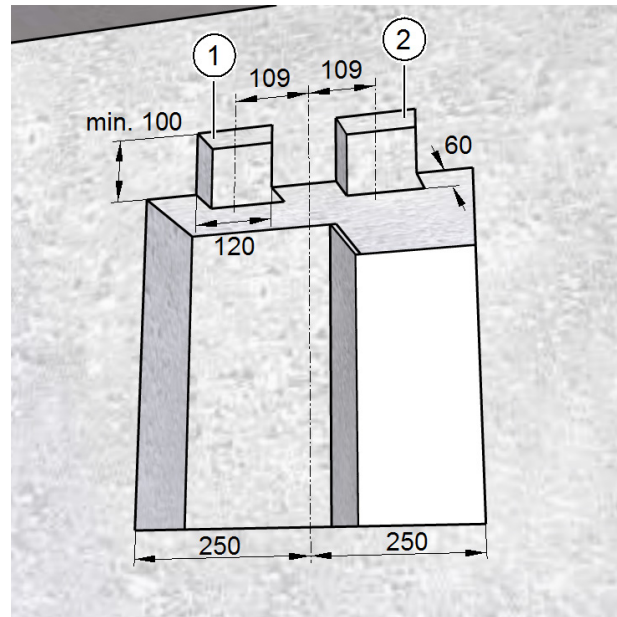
Chasing out channels for flat ductwork connections, dimensions in millimetres
